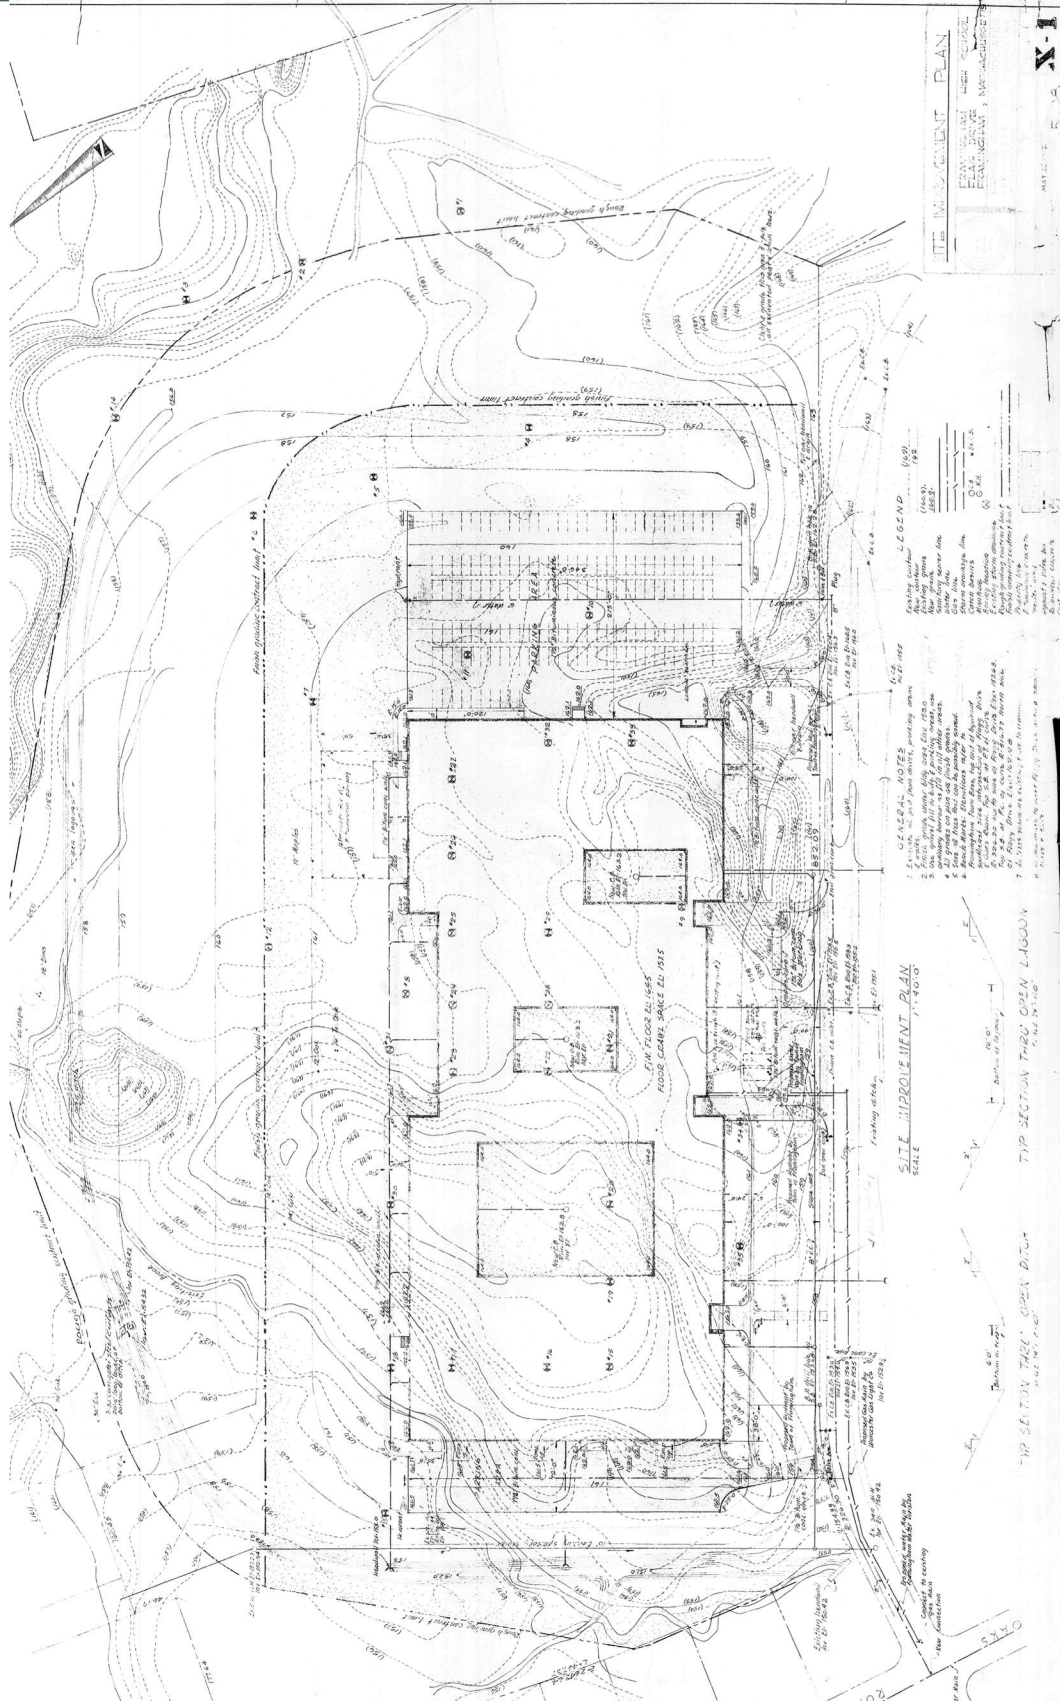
Site Plan showing 1956 Existing and Proposed Site Grading
